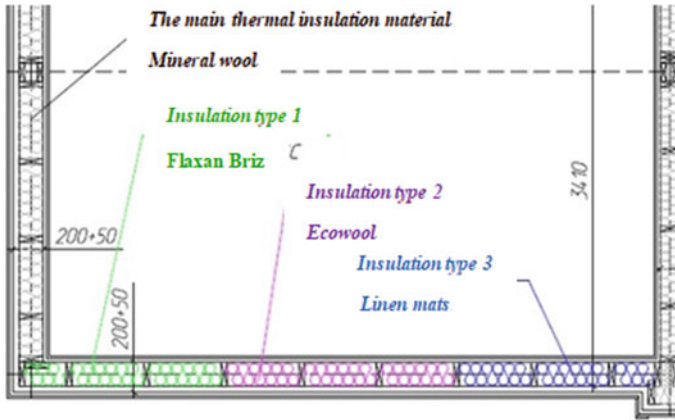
Placement of zones with additional types of heat-insulating materials in the frame wall
